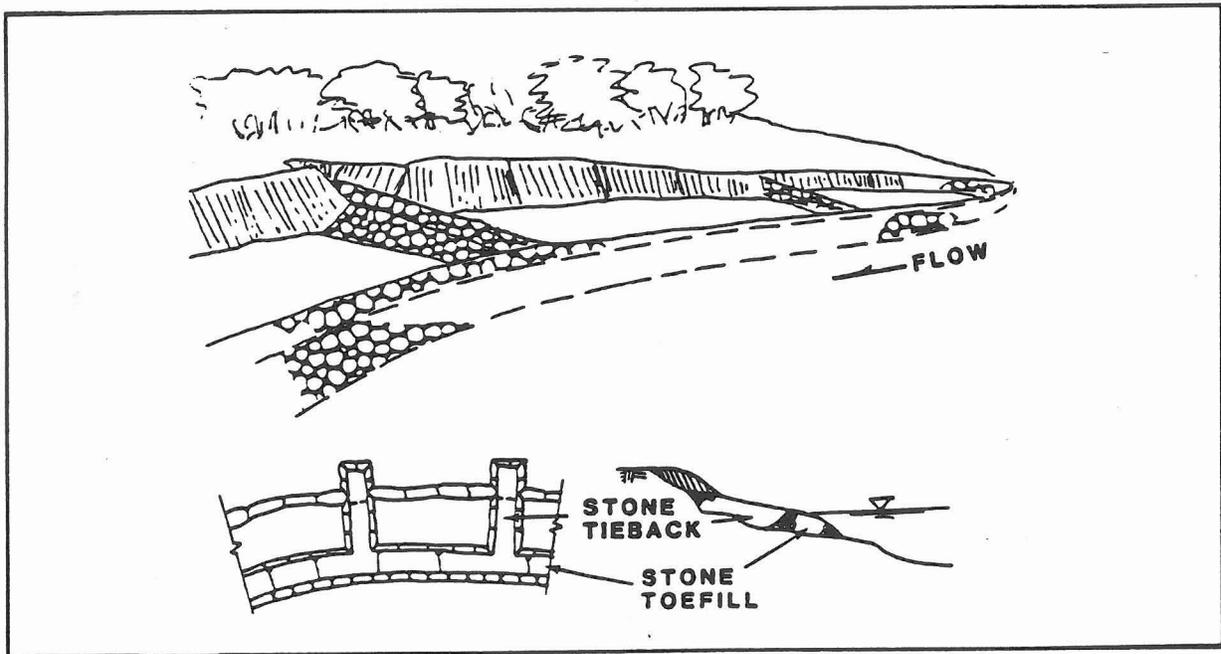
Longitudinal rock toe-dike tiebacks (After [37]).
